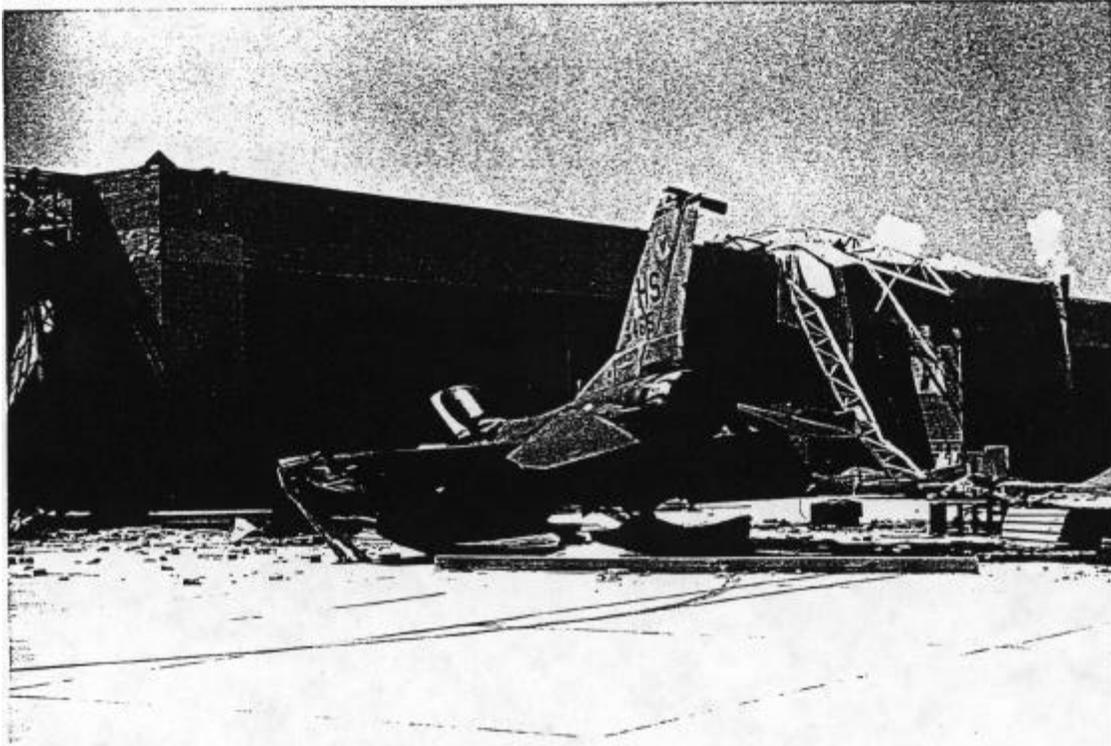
Large Missiles Generated by Failure of Fully Engineered Building
